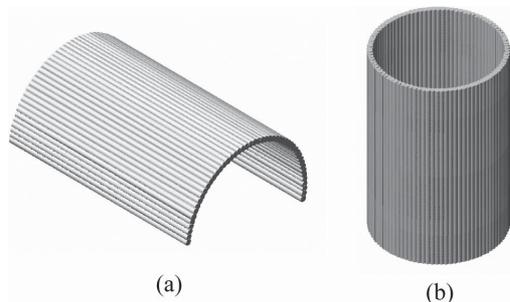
Typical jet-grouted supporting structures for tunnels (a) and shafts (b).
